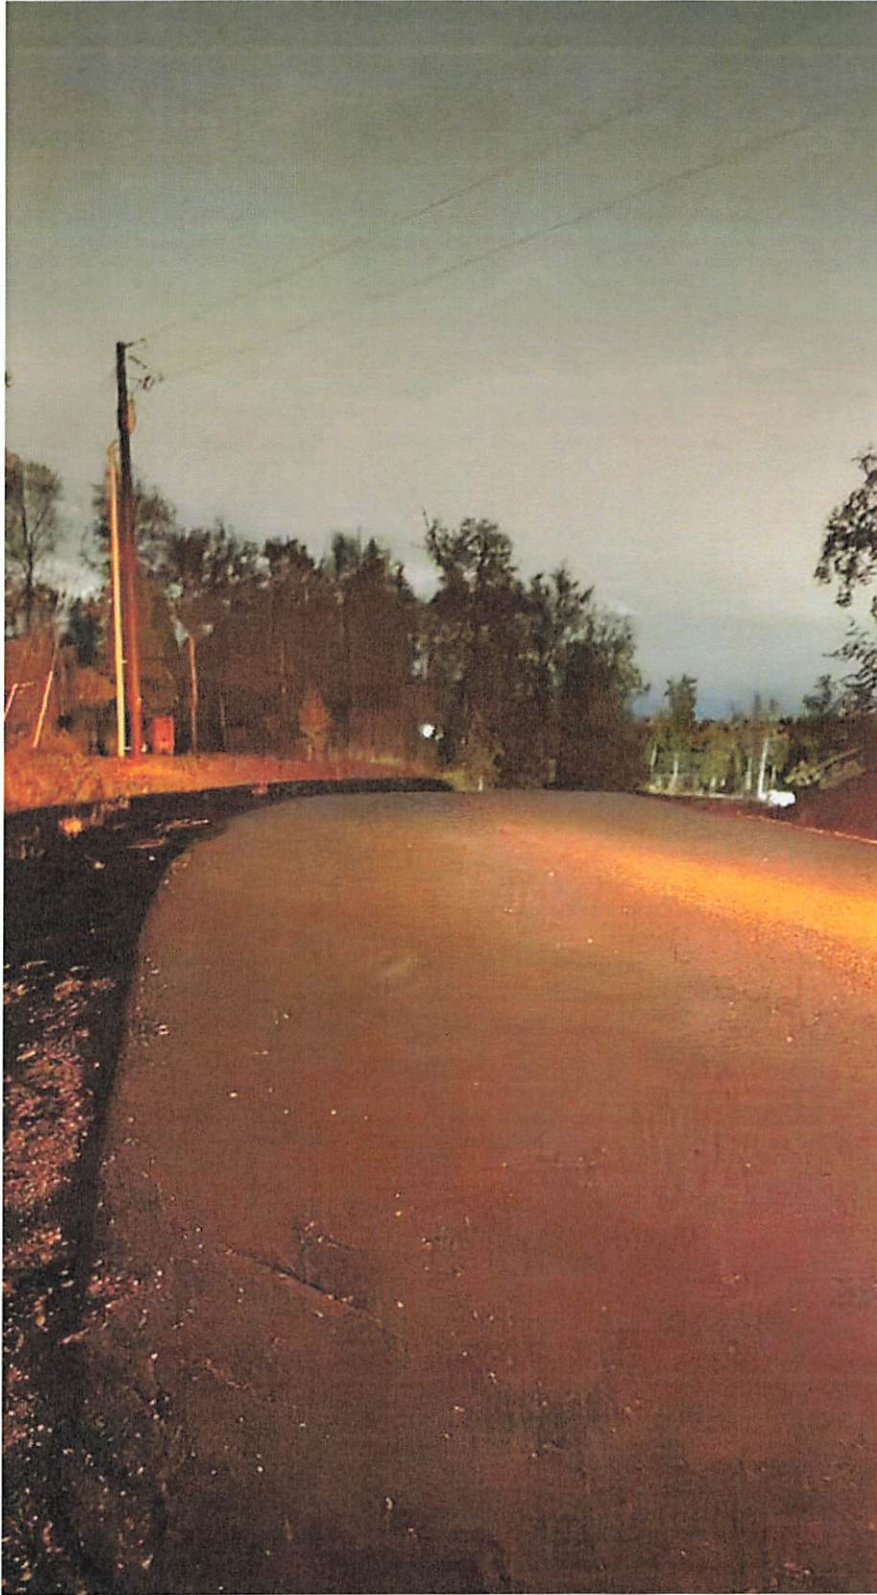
Look towards the left of new proposed road site with flash on at 5:30 am on 9/15/2026
